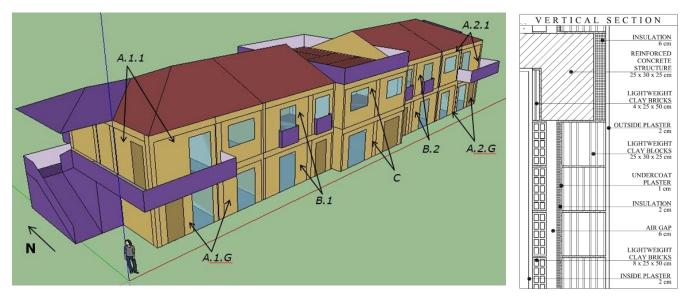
Left: view of the terraced-house apartment building modeled on SketchUp. Right: detail of the external envelope.
